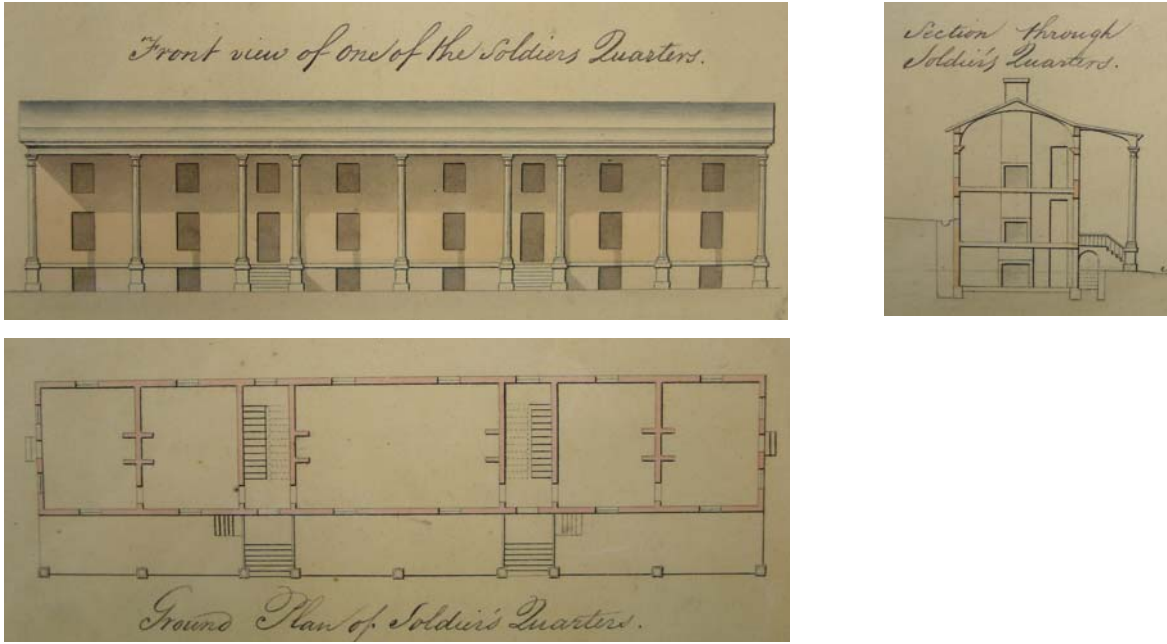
Front view, section elevation, and plan of proposed new Soldier's Quarters at Fort Columbus, October 17, 1832.
